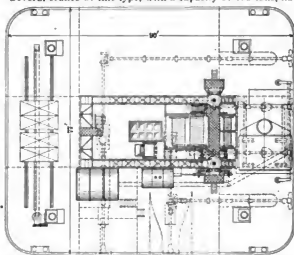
PLAN VIEW OF PONTOON, SHOWING LOCATION OF PROPELLING MACHINERY.
